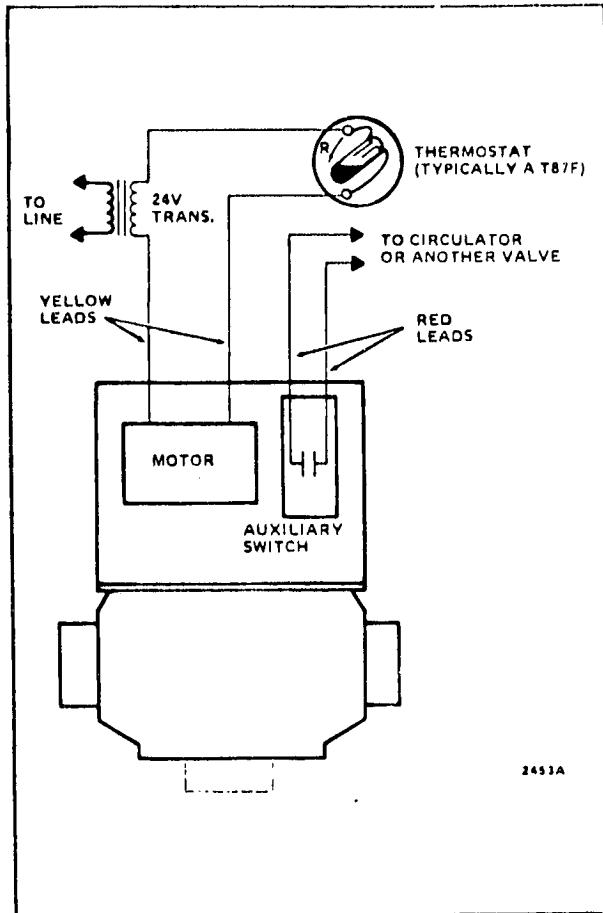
TYPICAL WIRING FOR V8043E, V8044E.
